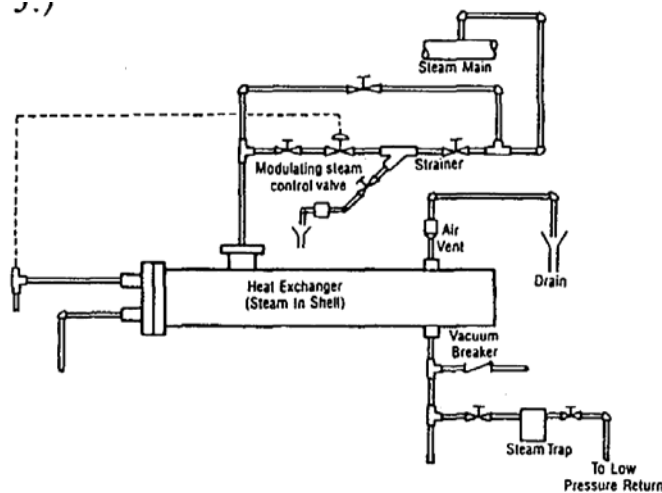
Shell and Tube Heat Exchangers (Typical Piping Diagram)
